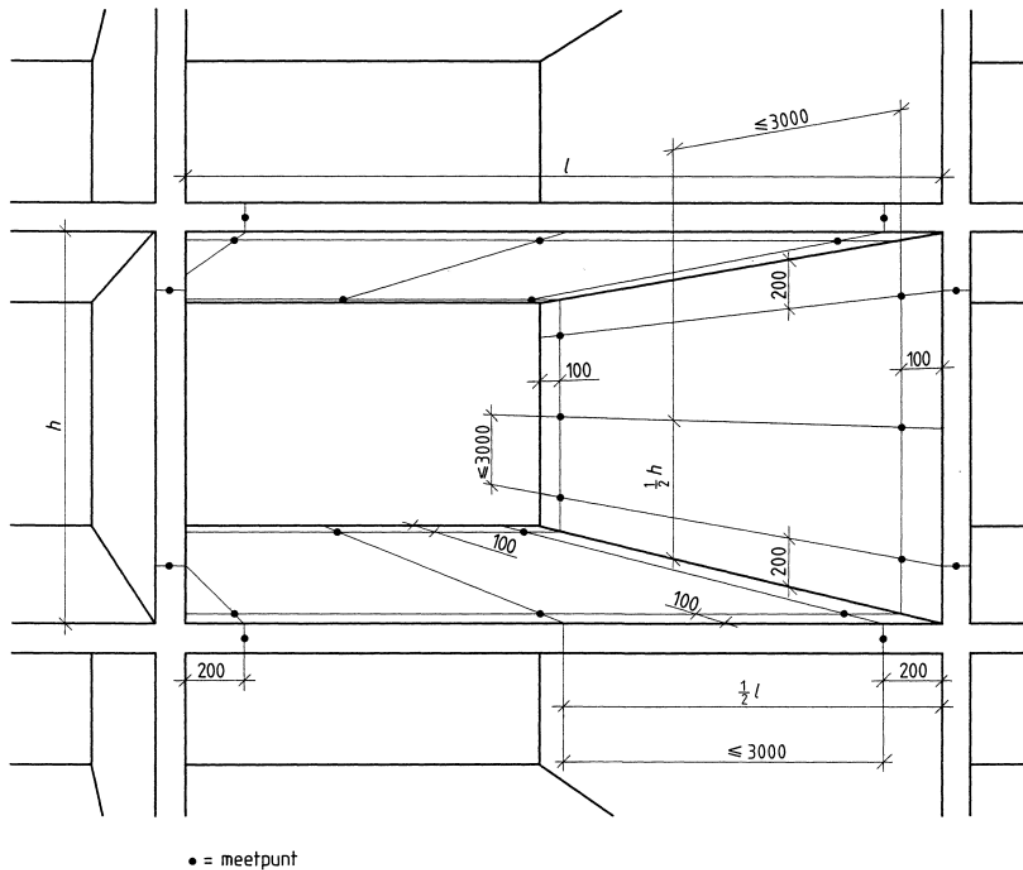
Location of the measurement points at walls and floors [NEN, 1990]
